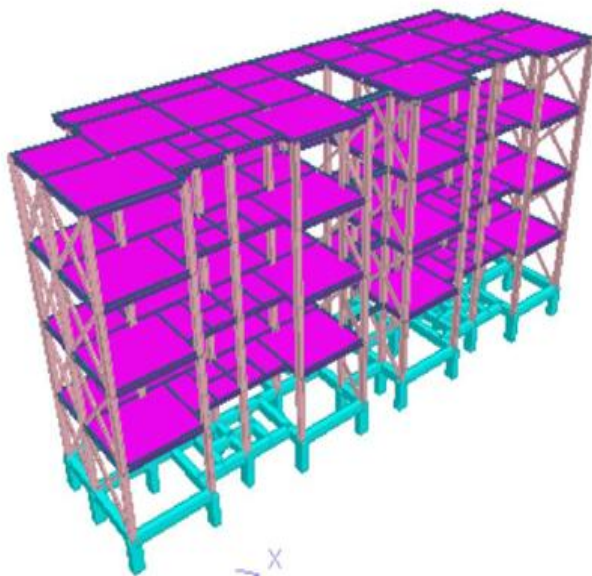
3D View of G+3 Prefabricated Building in Staad Pro
